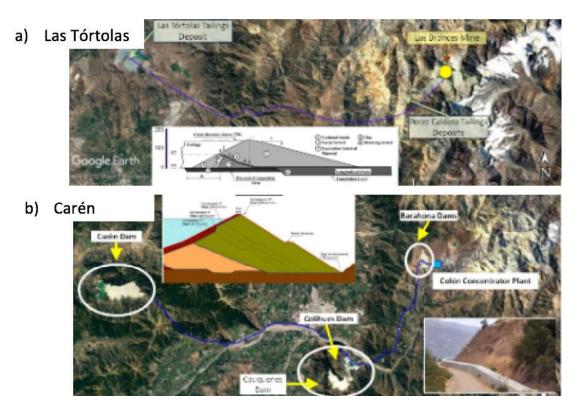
Location and typical cross section of TSFs examples from Central Zone.
